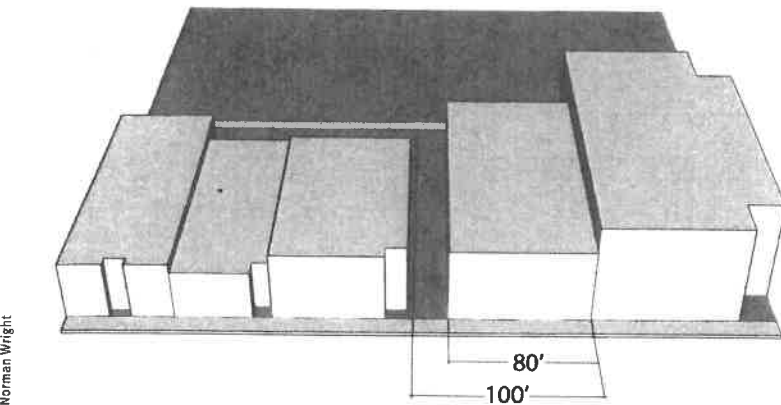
A block face with a building illustrating the maximum permissible deviation from the build-to-frontage ratio
